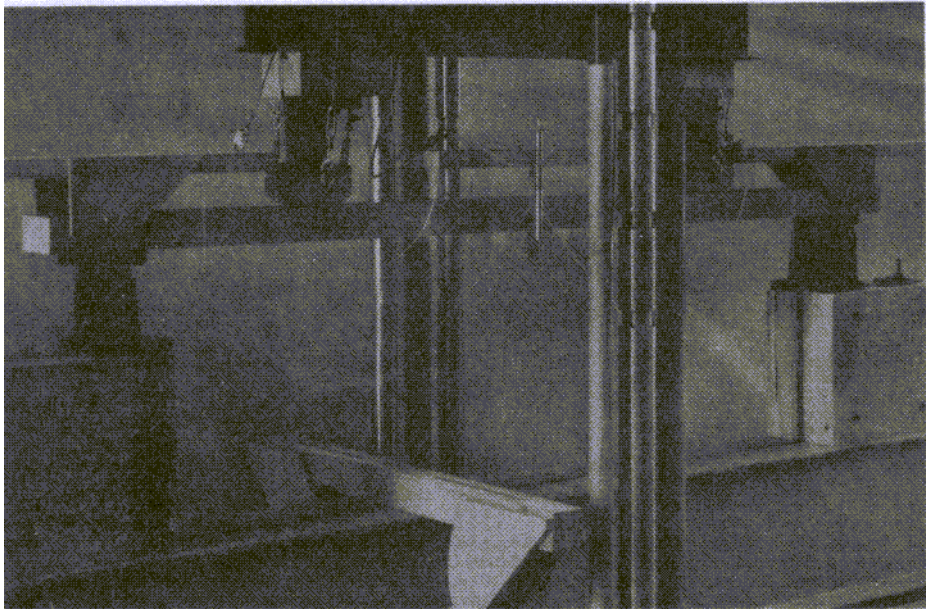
Floor level view of equipment used to evaluate the 2-lamination beams. Similar, but larger setups were used to test the 4- and 6-lamination beams.
